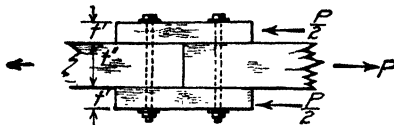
Typical bolted joint—bolts in “double shear.”
